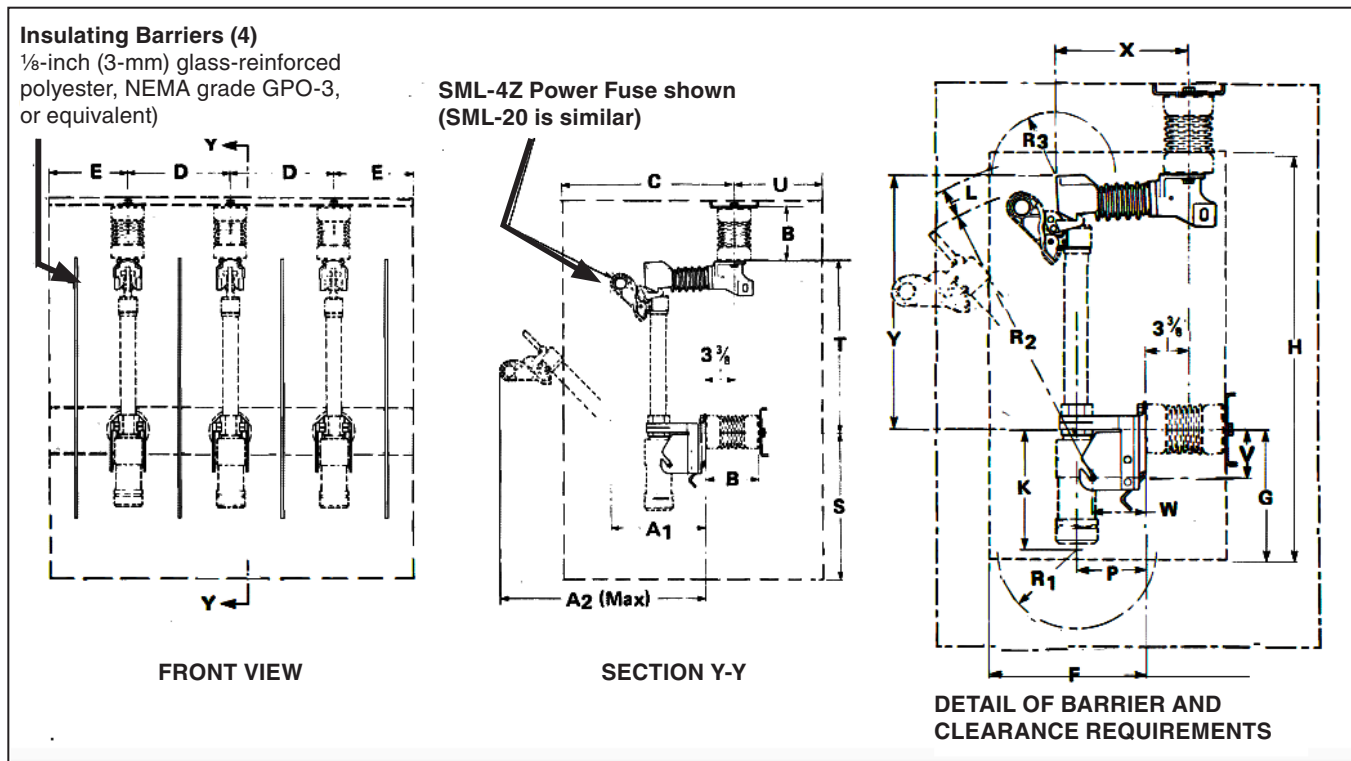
Enclosure and Insulating-barrier dimensions for a mounting configuration using a back-supported hinge-and-lower-contact assembly.
